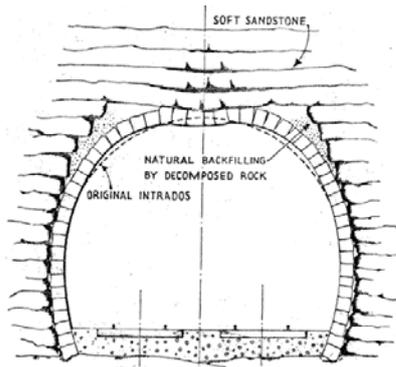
Deformation of a malconstructed tunnel arch by loosening pressure
